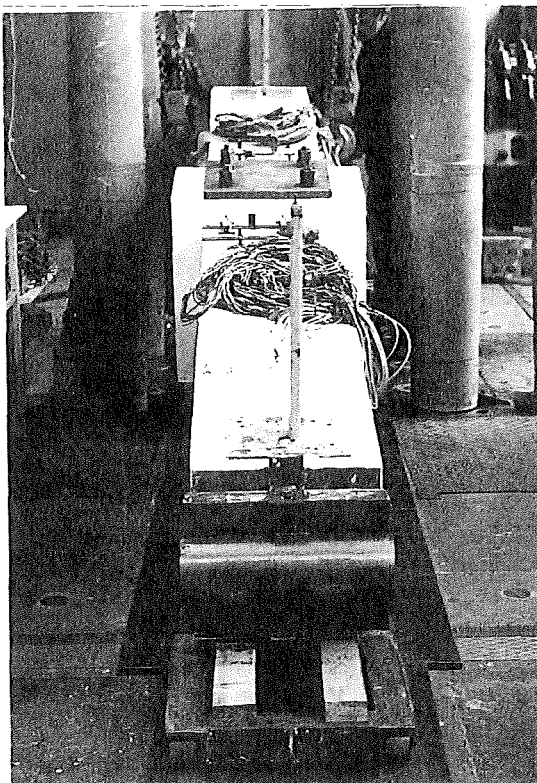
A COLUMN UNIT BEING PULLED TO POSITION UNDER THE TESTING MACHINE
